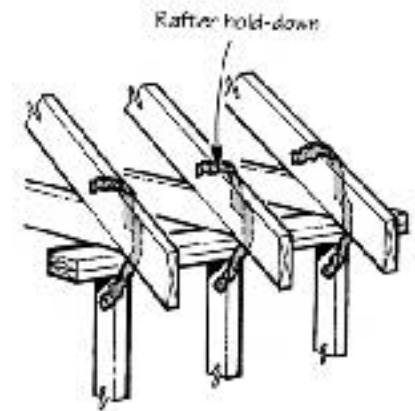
Metal connectors help resist the huge uplift forces coastal homes are subjected to. Hurricane connectors secure joists to girders, strap ties connect first-floor studs to second-floor studs, and rafter hold-downs tie rafters to top plates and studs.
